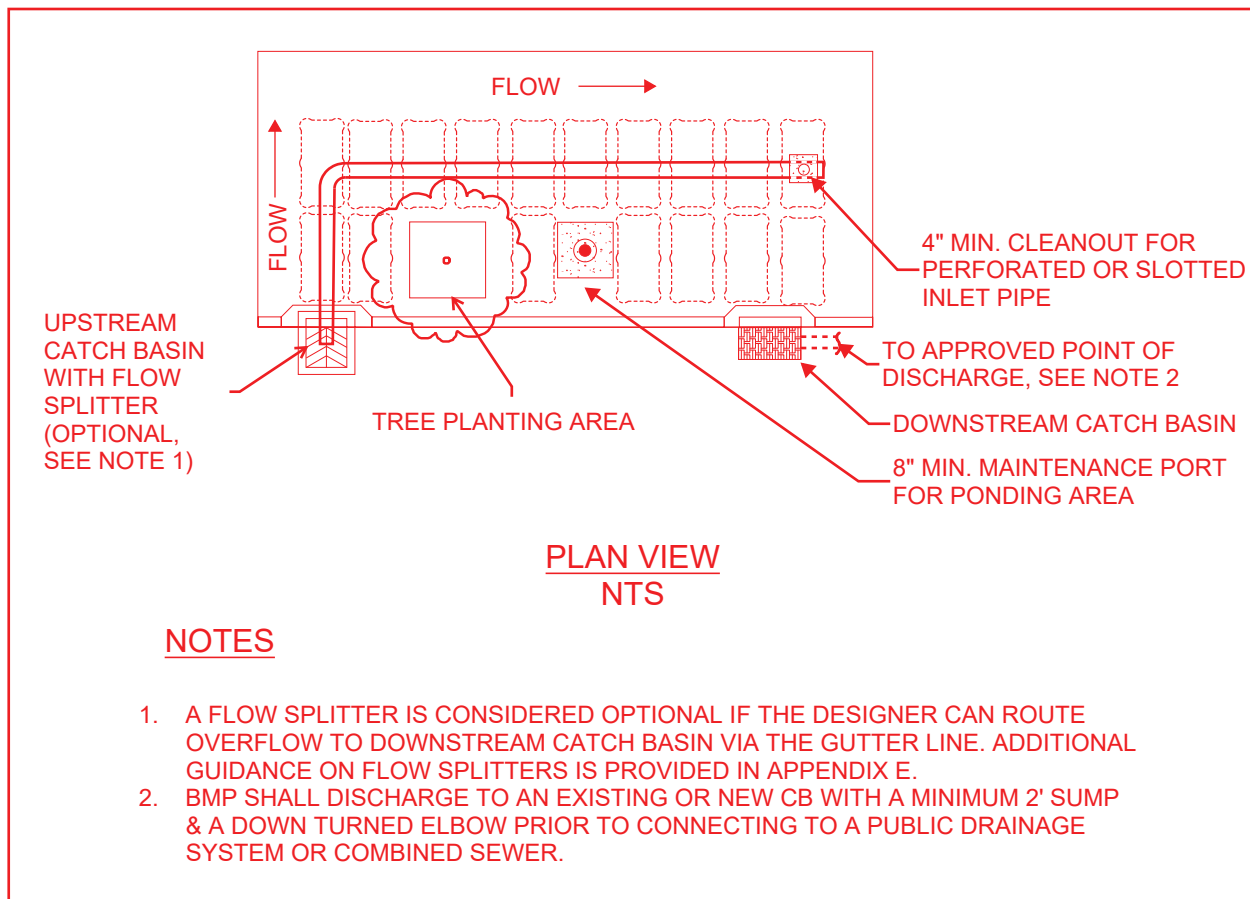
Infiltrating Soil Cell Bioretention (without Underdrain) Plan.
